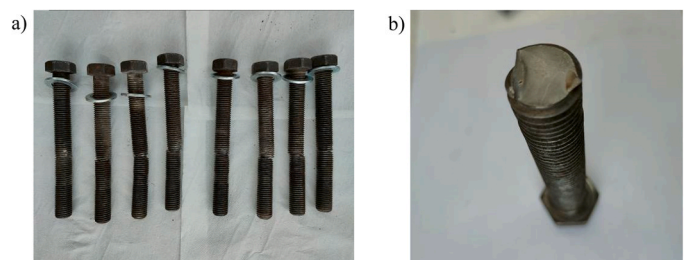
Test P3.1-T20: a) bolts after shear failure; b) detail of the sheared section of one bolt.
